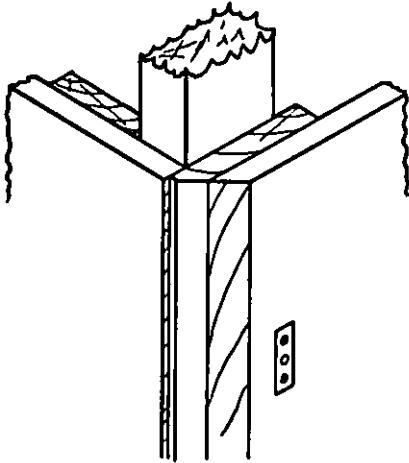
Bolted corner construction of community form. The side boards are nailed to the vertical "extra strips," the edge of which sets back about a quarter-inch from the corner of the end boards. Wagon-box endgate rod nuts or screw plates, fastened in place by screws as shown, are better than the ordinary bolt nuts which are lost in moving. Batten on loose end board at left.
